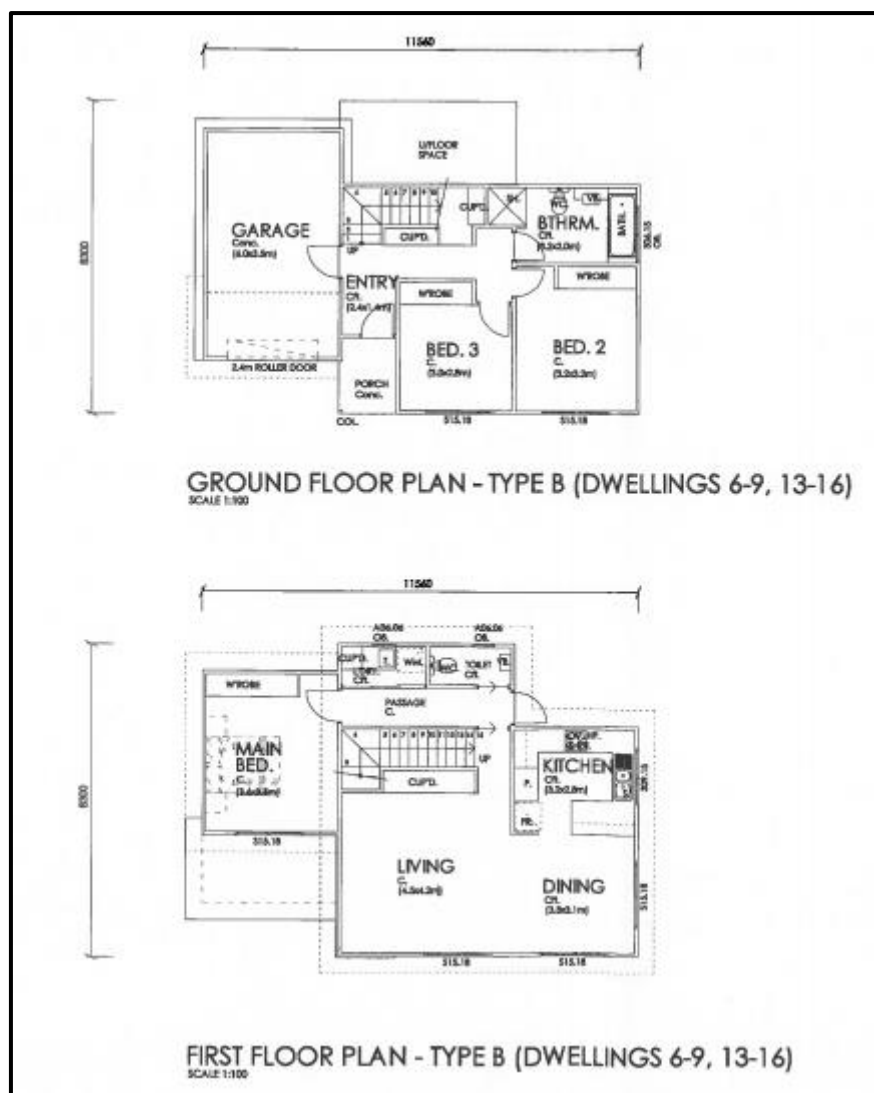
The floor plan of dwelling type B showing access to the private outdoor space via the first-floor passage.
